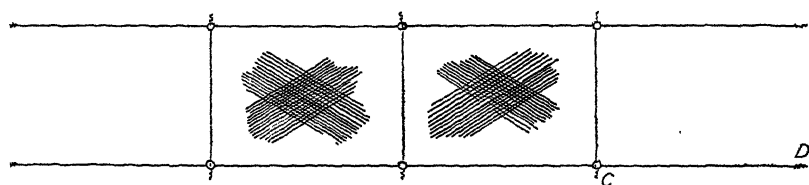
SHOWING LONGITUDINAL AND CROSS BOLTS, AND WIRE-NETTING FLOOR CONSTRUCTION.
